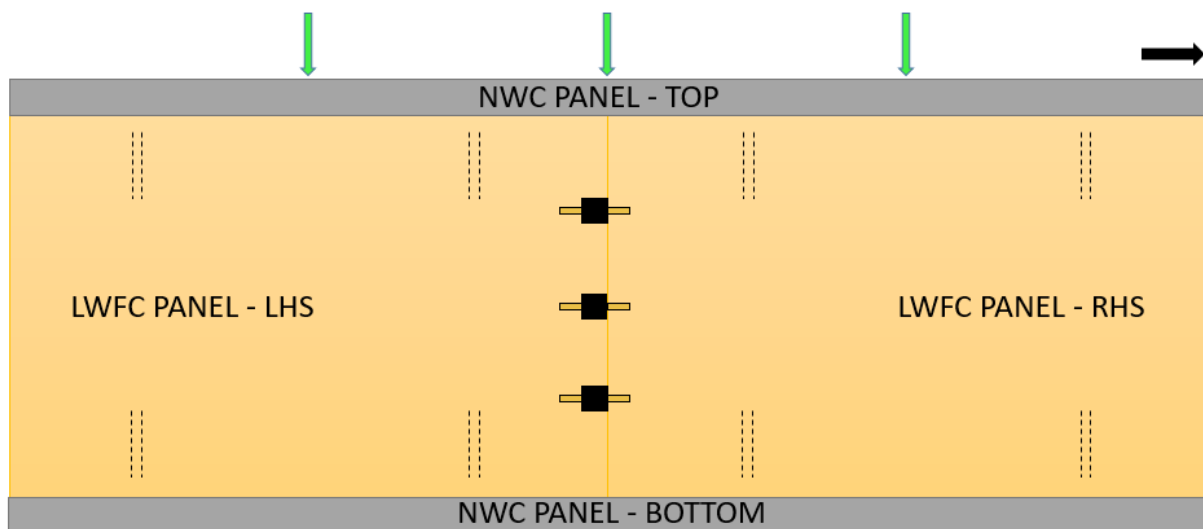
Physical scale test 3 showing pull-over load and connection placement. Three vertical connection boxes and four horizontal grouted rebar per LWFC panel are indicated.
